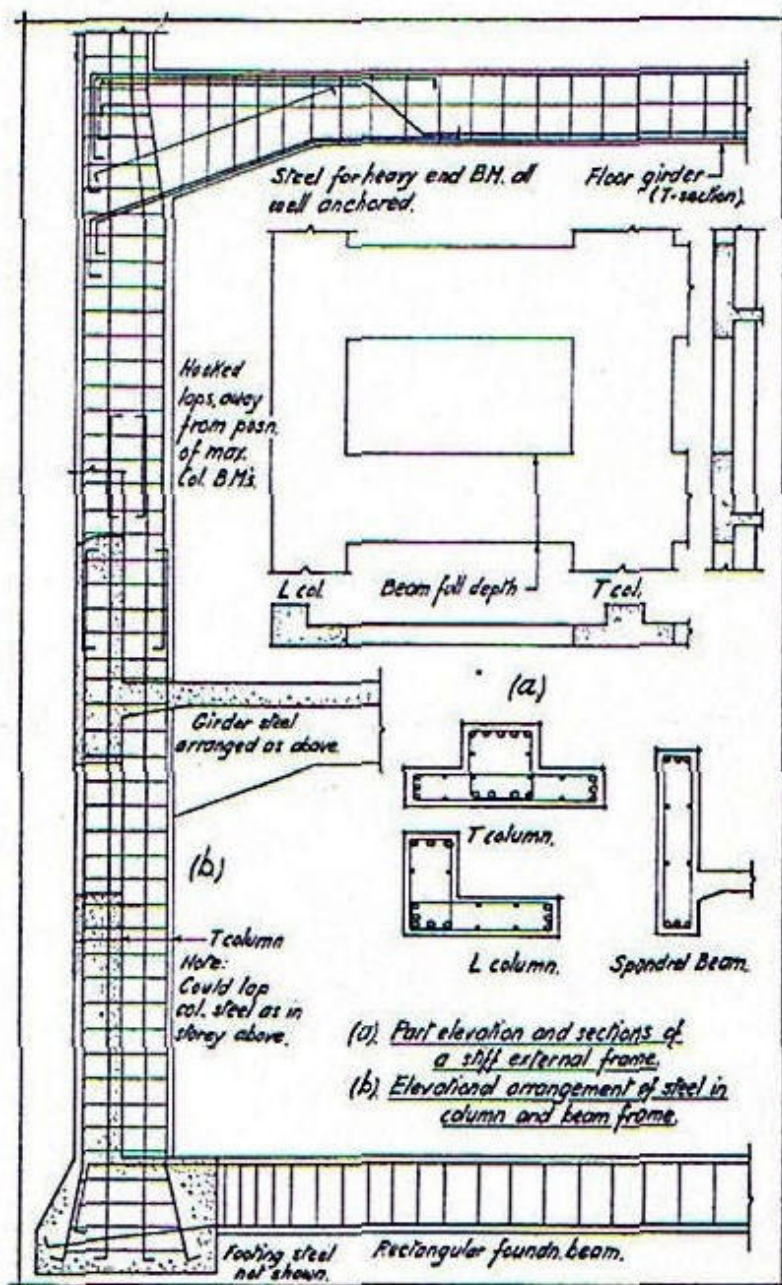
1930's Japanese detailing of a reinforced concrete frame. From Crookes (1940).
